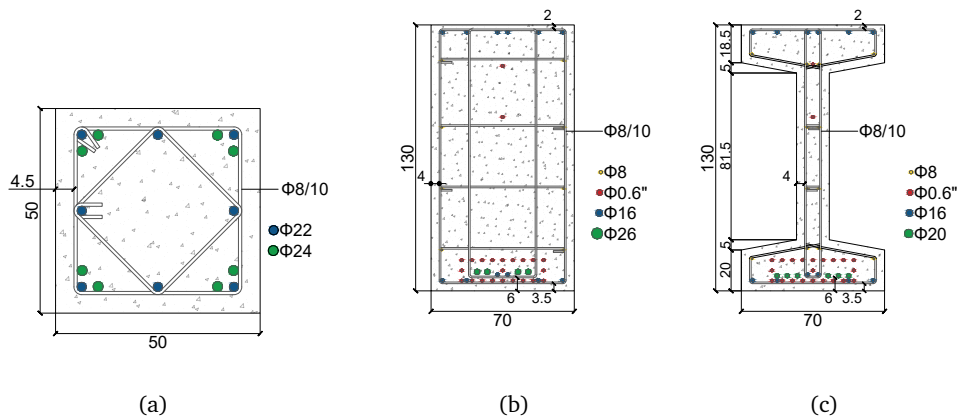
Elements detailing: a) column base (section 1-1), b) beam end (section 2-2) and c) beam centre (section 3-3). Dimensions in mm.
